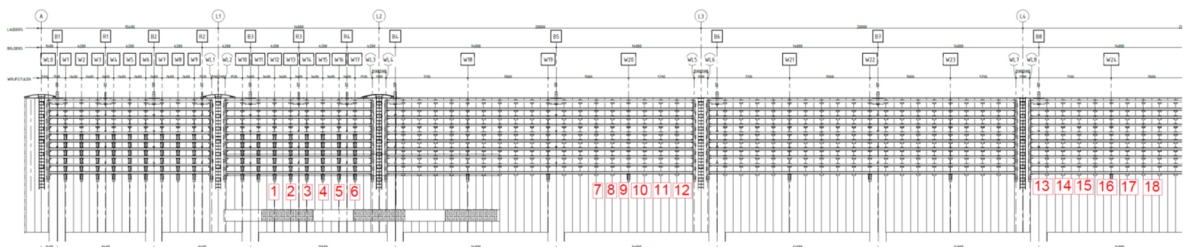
The location of the extracted sheet piles projected on the front view of the new sheet pile wall in de Voorsluis in Eefde, numbering per double sheet pile section. The estimated position of middle of the double #1 is at ~20.3 m from the front of the lock head, middle of #7 is at ~48.3 m and middle of #13 is at ~86.8 m
